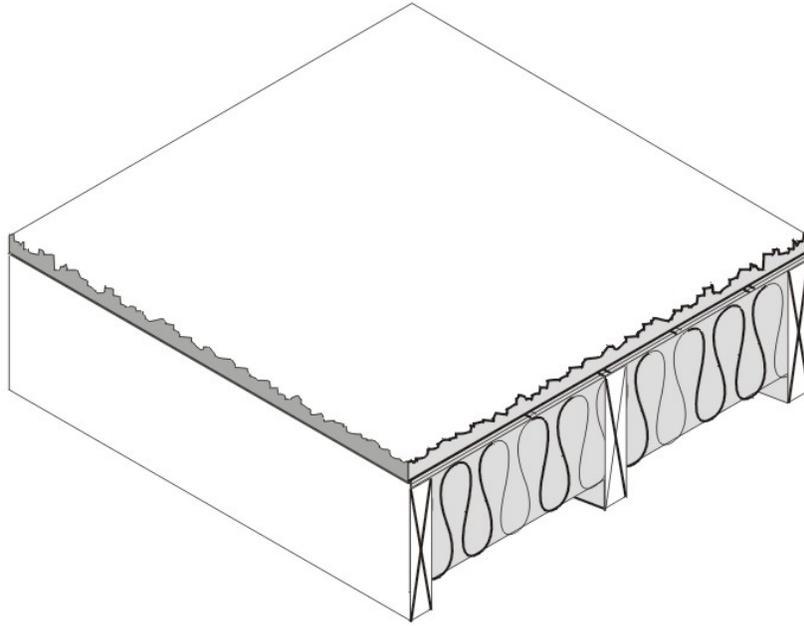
~~ – Wood Framed Floor without a Crawl Space
